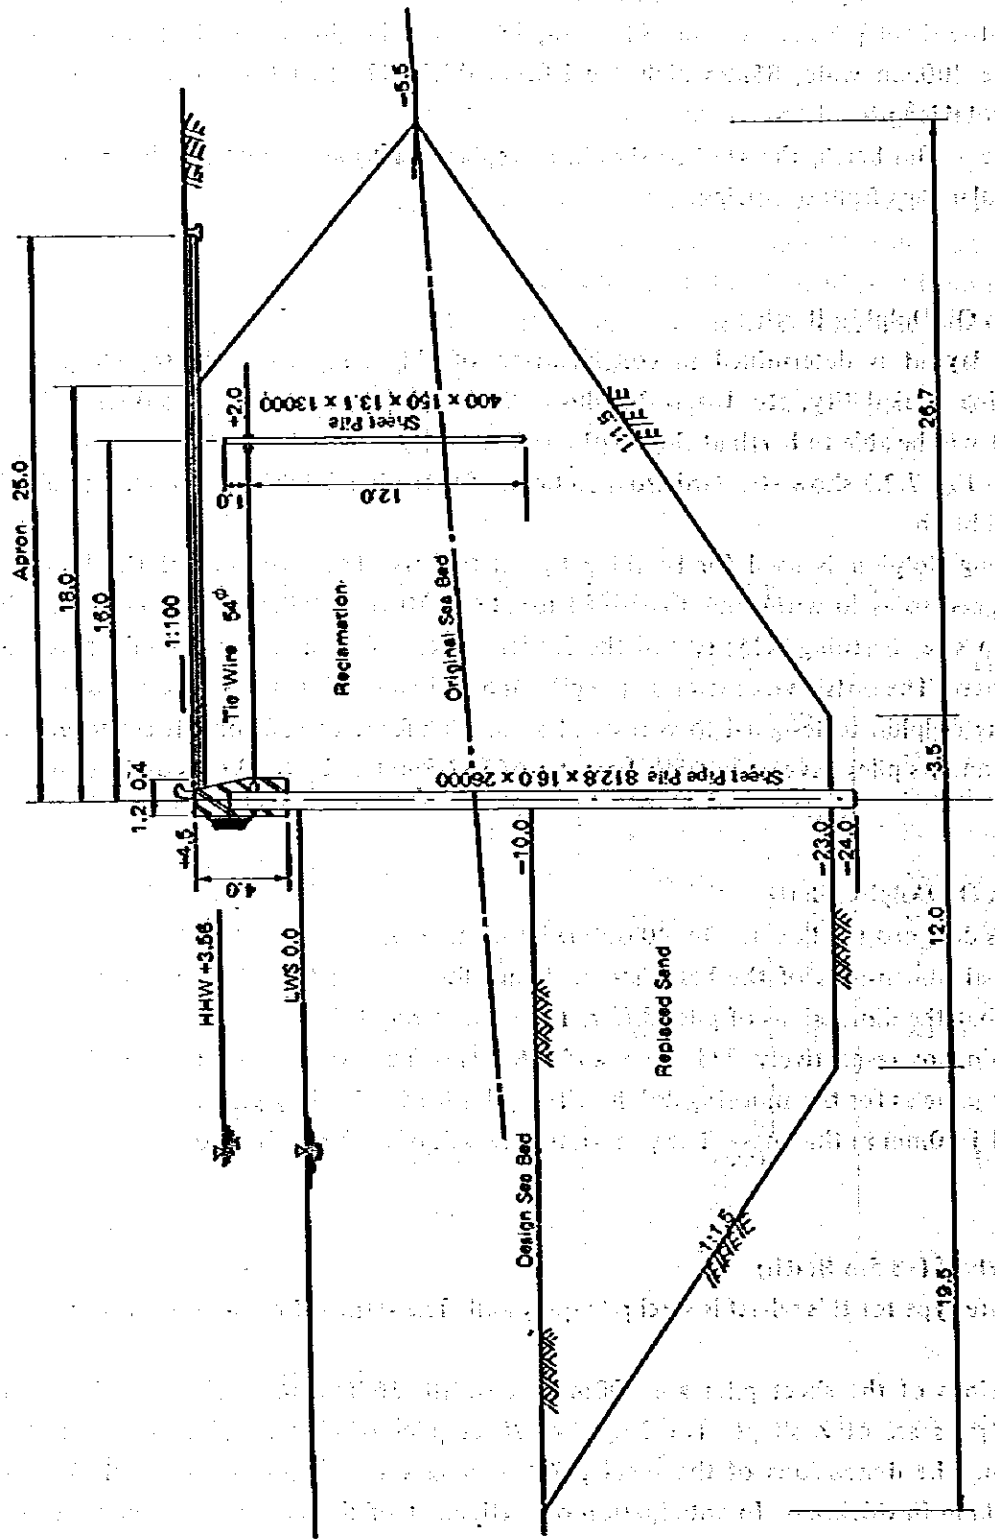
Standard Section of Alternative Plan A (Sheet Pile-Type Quaywall - 10m Berth)
